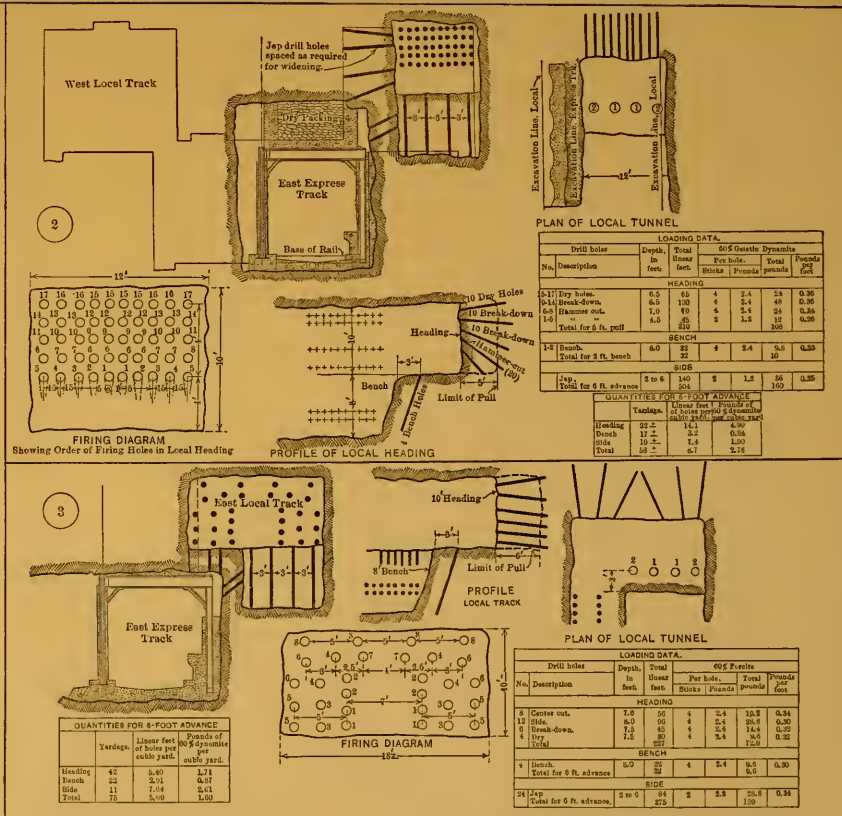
EXCAVATION FOR LOCAL TRACKS IN FOUR-TRACK TUNNEL.
